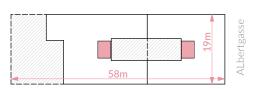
Stutzflügelhaus schema built between 1884-1918 S 1:1000
